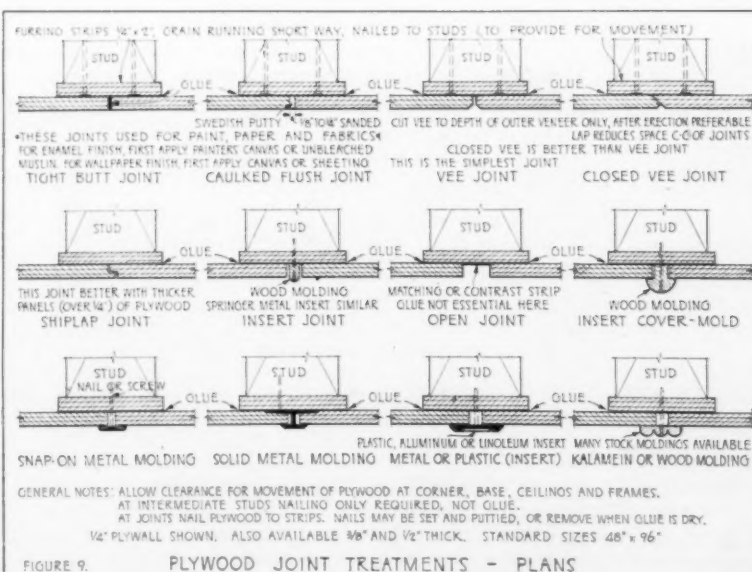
PLYWOOD JOINT TREATMENTS - PLANS
